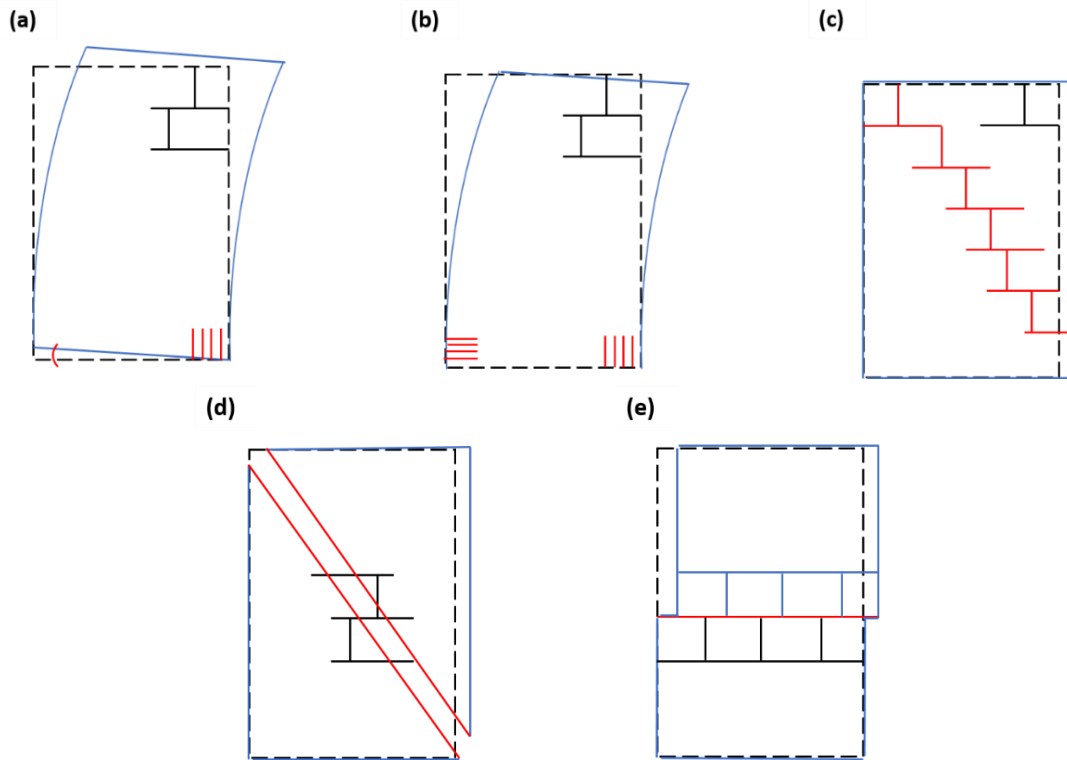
In-plane masonry walls failure modes when subjected to vertical and lateral load: rocking flexural behavior (a), toe crushing (b), diagonal shear sliding (c), diagonal cracking (d) and horizontal sliding (e).
